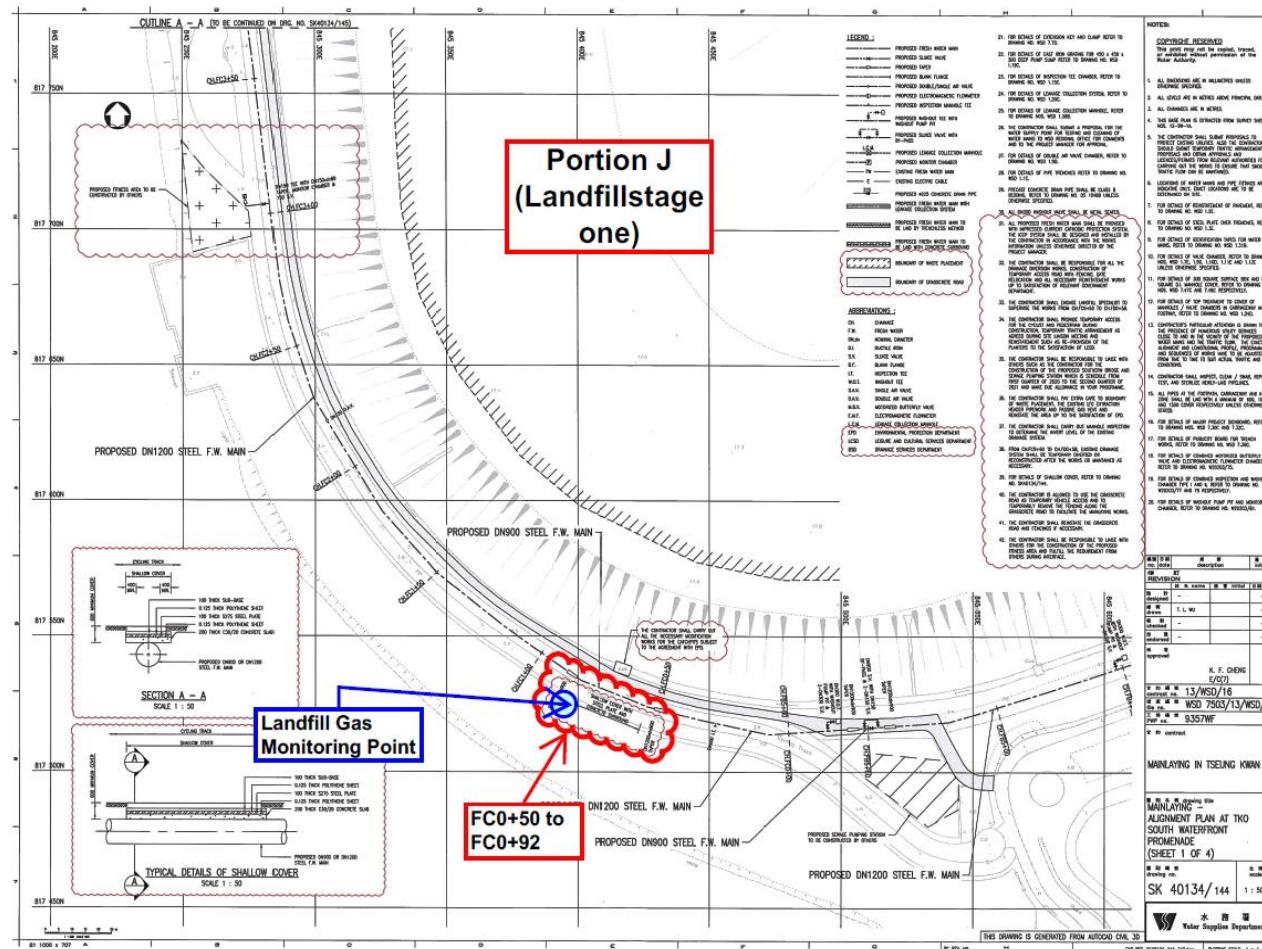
Location Plan for Portion J – Landfill Stage 1 (FC0+50-FC0+92)
